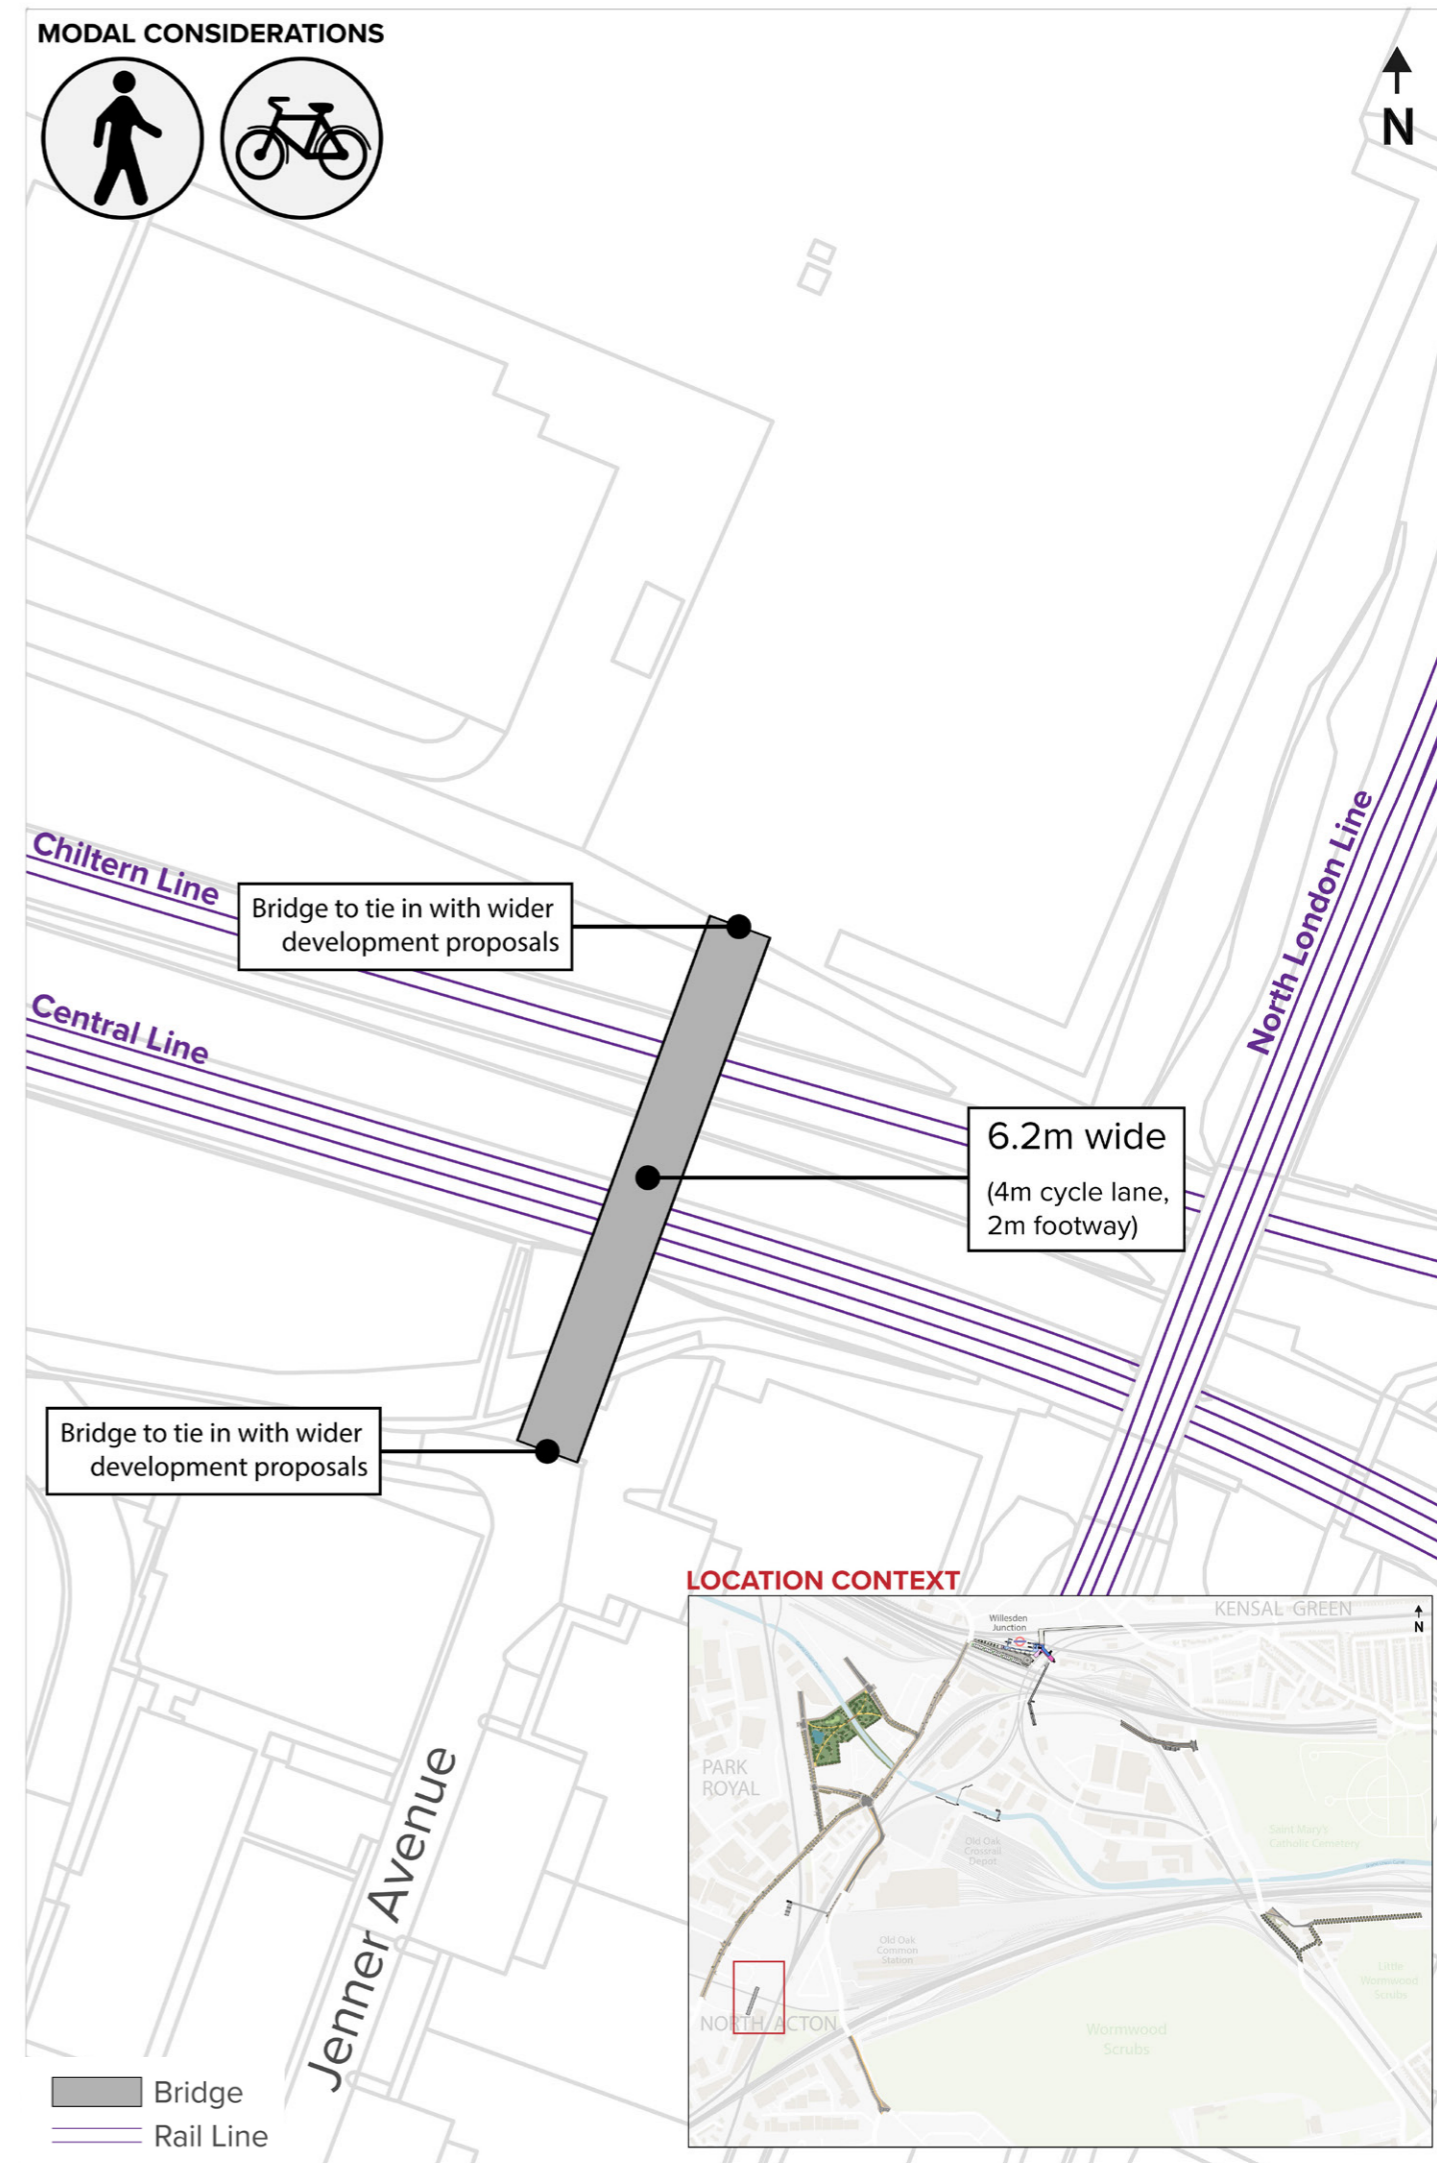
Intervention 1, proposed layout for the new pedestrian and cycle bridge
